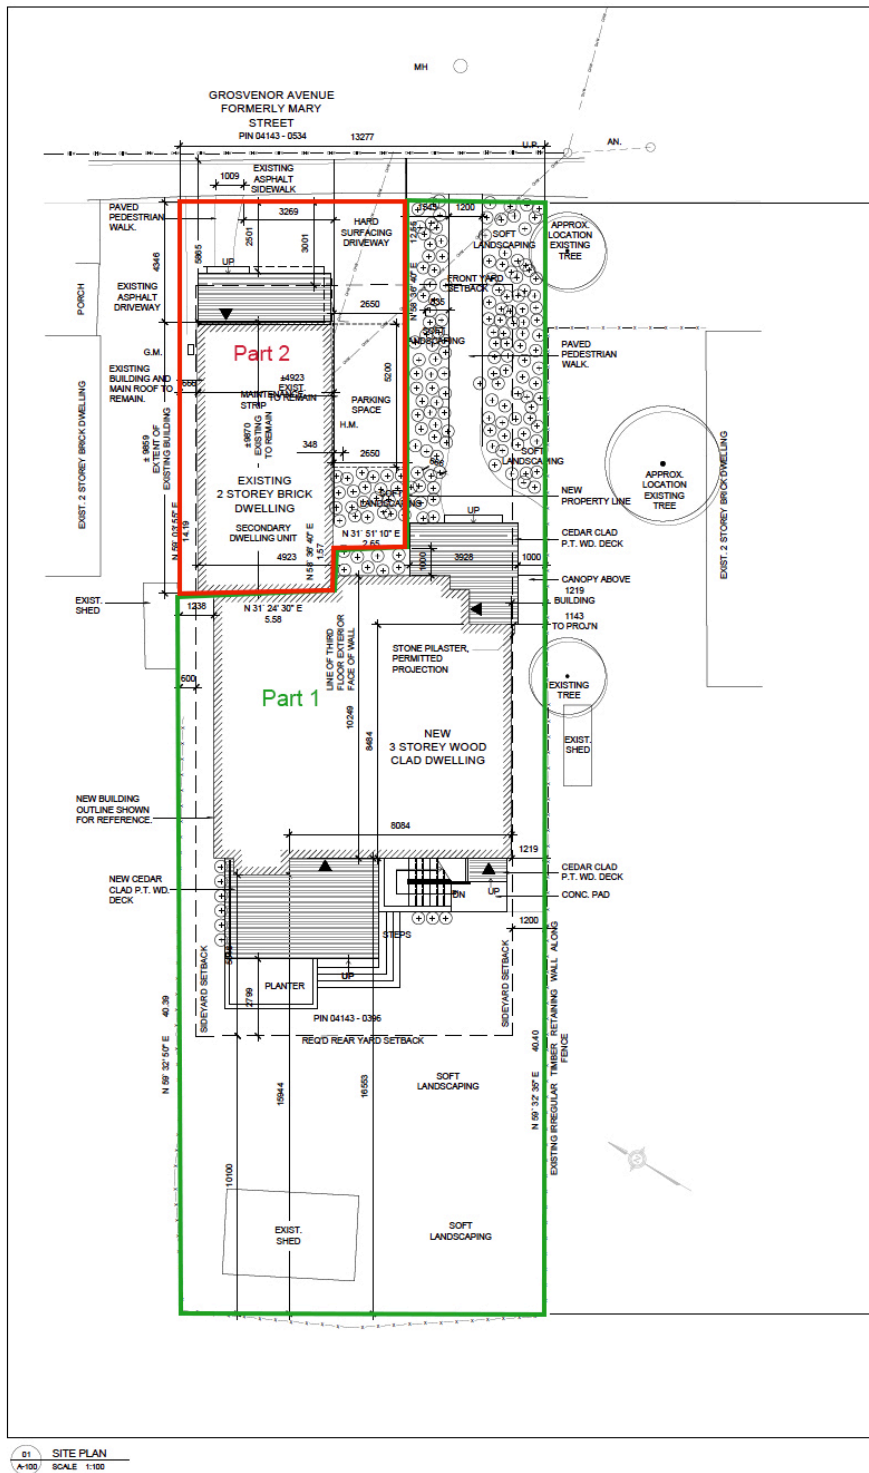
Extract Site Plan, Prepared by Flynn Architect Inc. (marked up by Q9 Planning).
